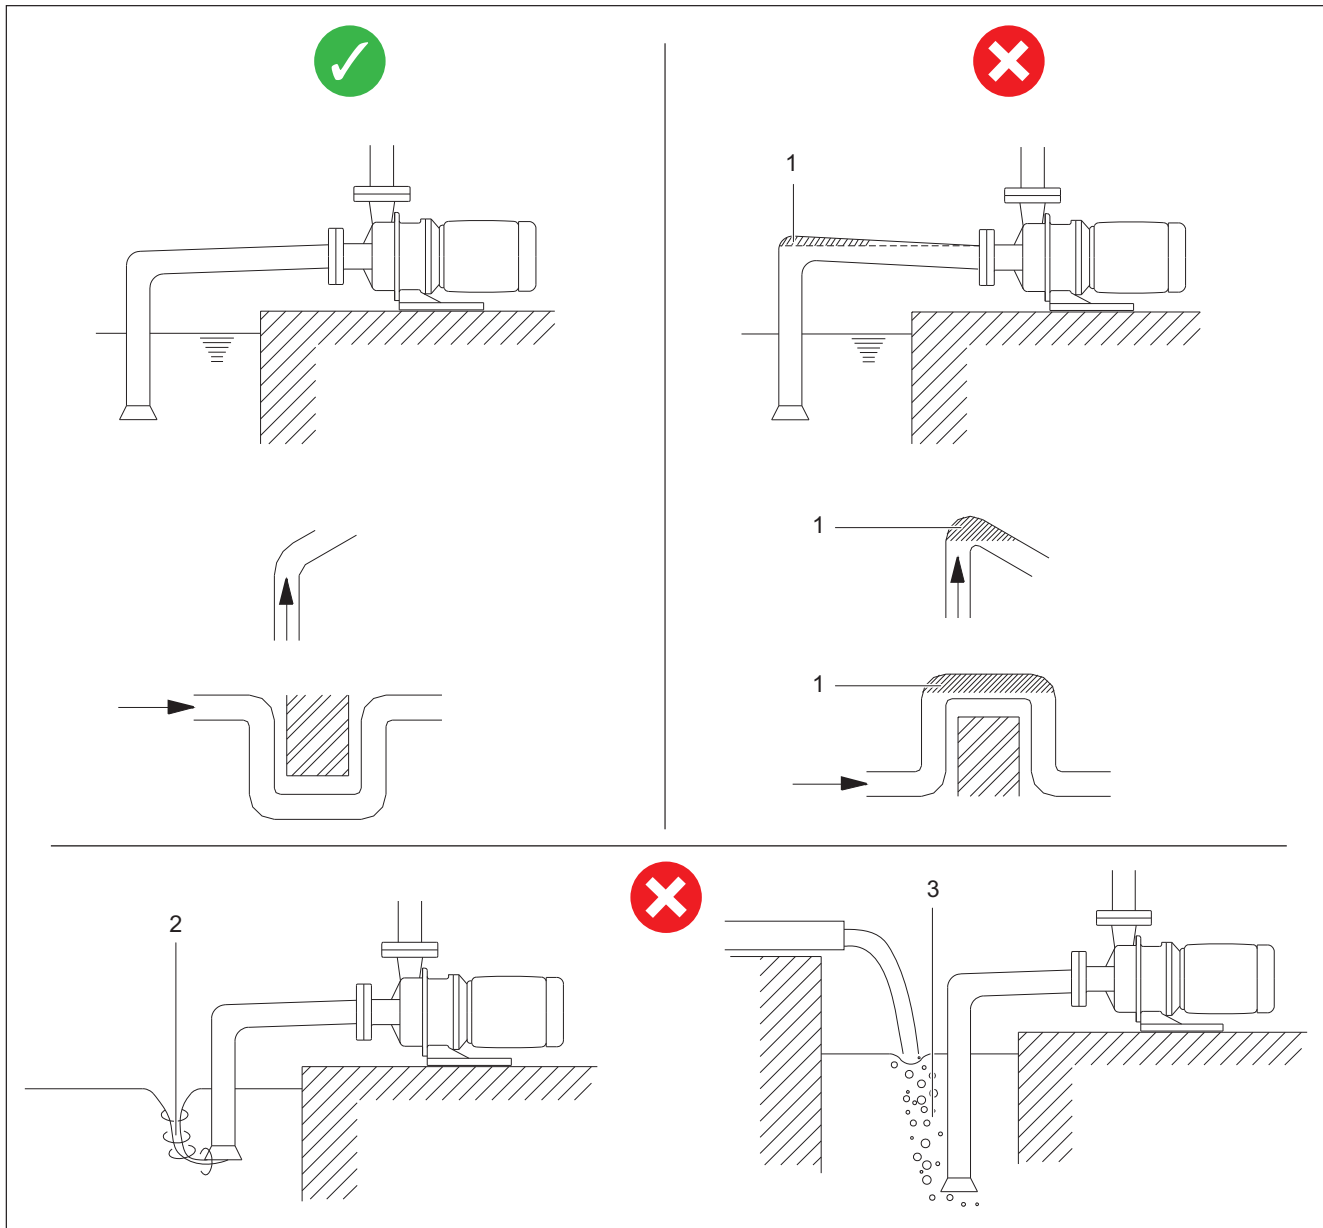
Permissible (✓) and impermissible(X) installation conditions
